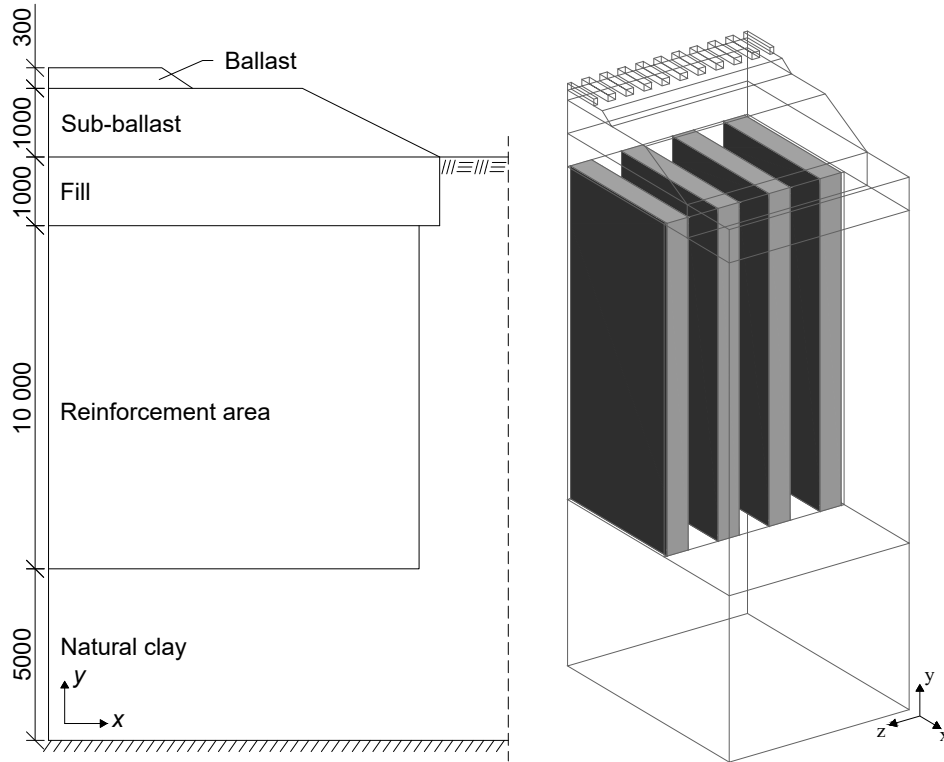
Left: A cross-section of the railway embankment and layered substructure used in Model A. Right: A schematic illustration of the Wall reinforcement configuration with DMC walls installed within the soft clay layer.
